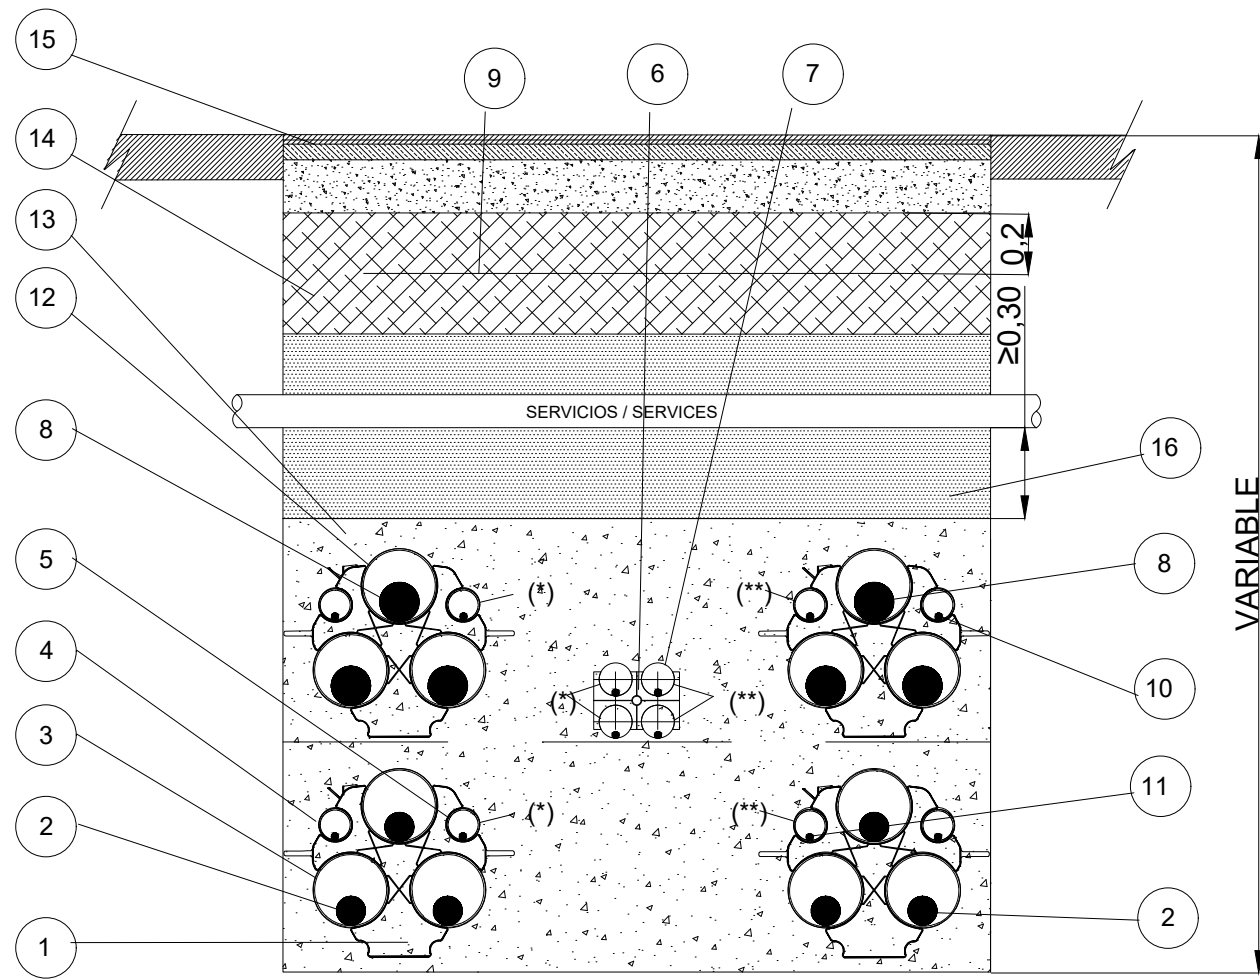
TYPICAL SECTION FOR PARALLEL SERVICES (GAS PIPELINES) / DETALLE / 4 SECCIÓN TÍPICA PARA SERVICIOS PARALELOS (LÍNEA DE TUBERÍAS DE GAS)
